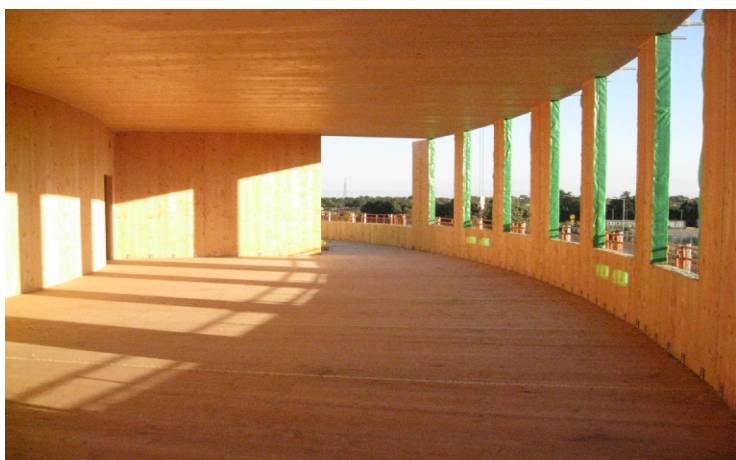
Norwich Open Academy (Norwich, United Kingdom)
